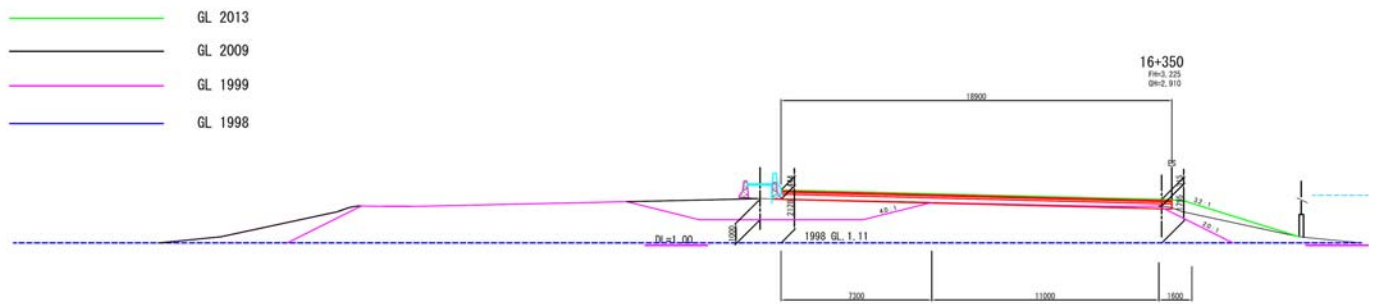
Studied Cross Section (Sta.16+700 Standard Section :BH-3)
